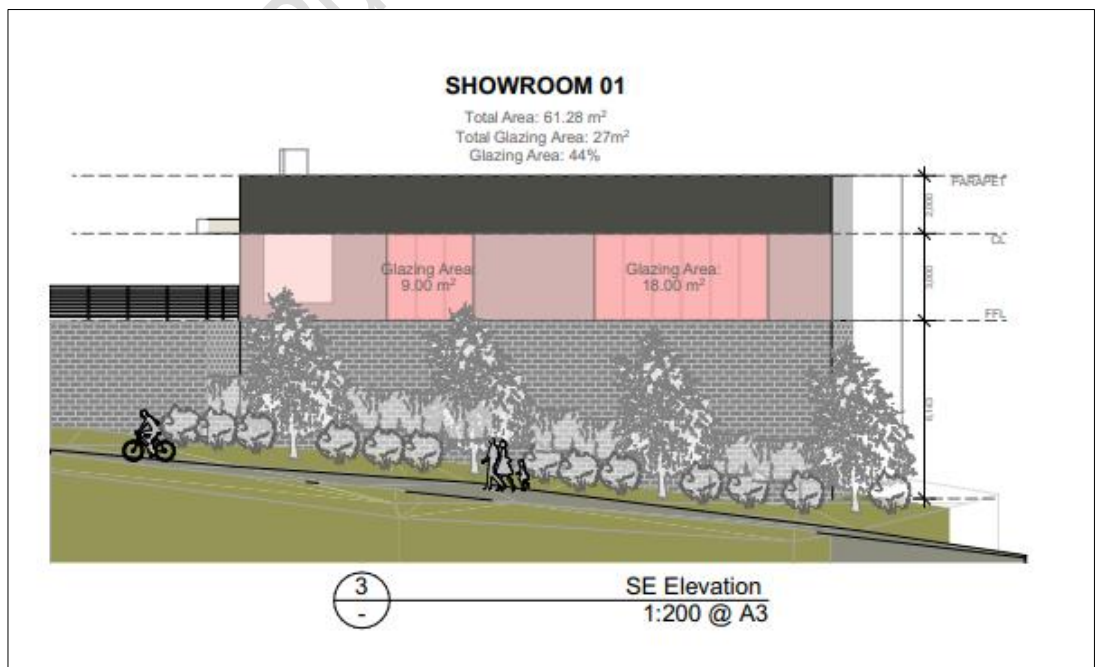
Elevation plan showing the areas of proposed glazing facing Maranoa Road
